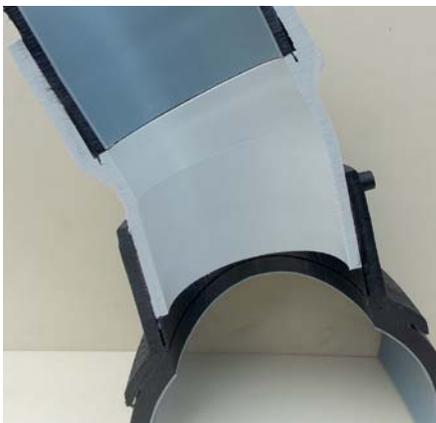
Section through a sewage saddle model ASA TL with connections between saddle and pipe section and between outlet and domestic service pipe
